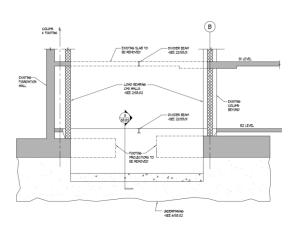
Section showing demo of slab and footing projects with underpinning locations, 4/S3.02
